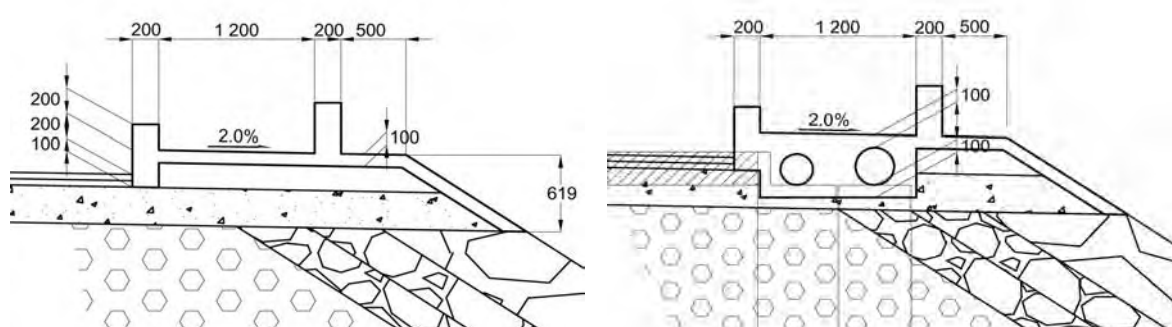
Cross Section of Sidewalks (Left: General, Right: Meyungs causeway west side)
